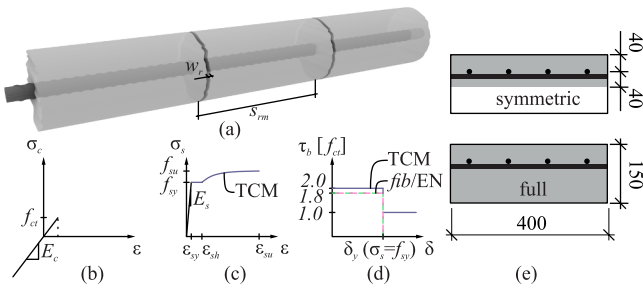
Cracked reinforced concrete under uniaxial tension: (a) schematic representation of a cracked reinforced concrete element; (b) behaviour of the concrete; (c) material behaviour of the bare reinforcing steel; (d) bond strength model; (e) considered cross-sectional areas (dimensions in [mm]). (Abbreviations: TCM: tension chord model, EN: EN 1992-1, *fib*: *fib* Model Code 2010).
